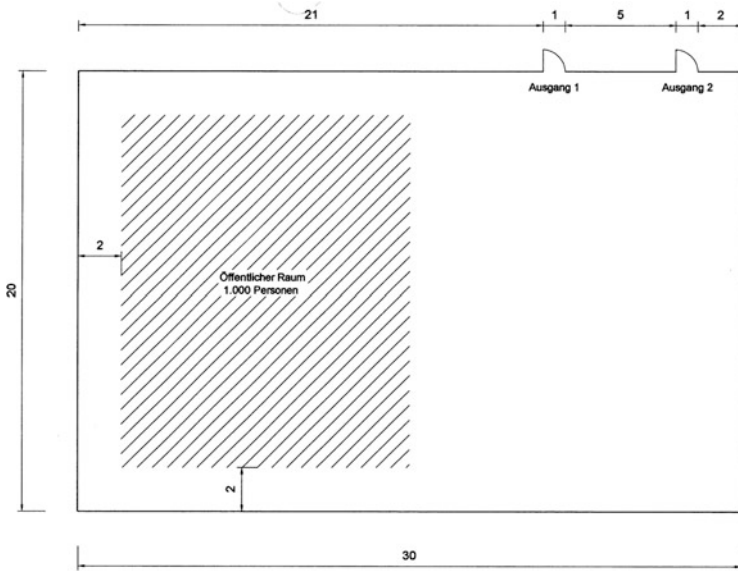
Floor plan for test case 11. Measurements are in m [5]
